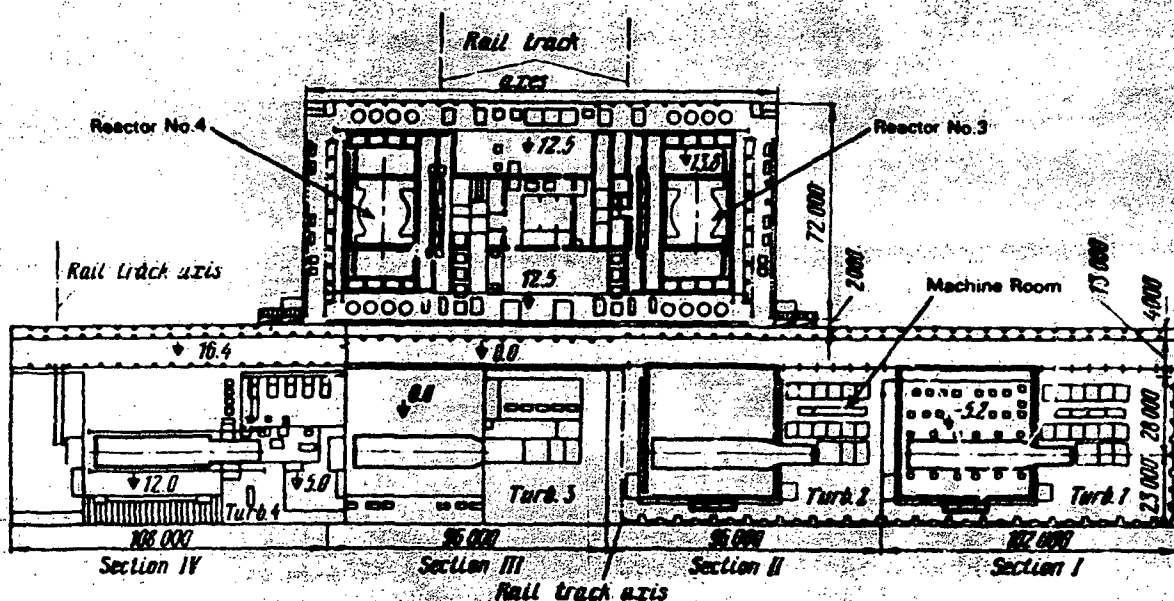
Layout of main building of Chernobyl Units 3 and 4
